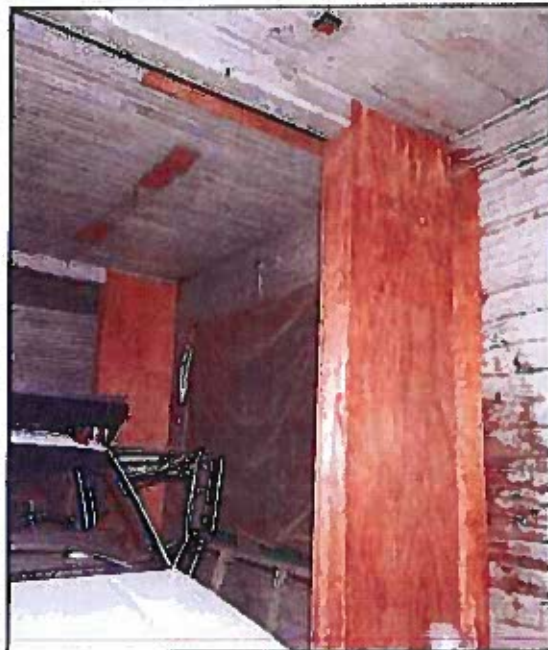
Past repair to stabilize rolled ceiling beam end and wall framing at first floor below dormer #4. The long term adequacy of the stabilization repairs should be evaluated by a structural engineer.
